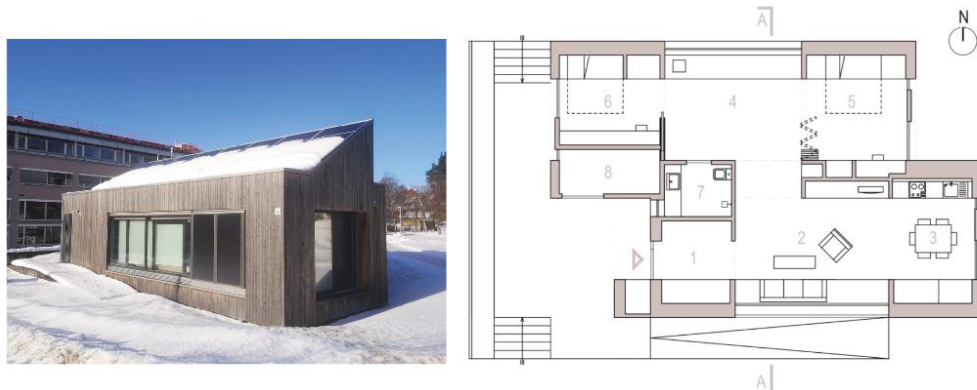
Case study building; left) View of Living Lab; right) Floor Plan [18]
